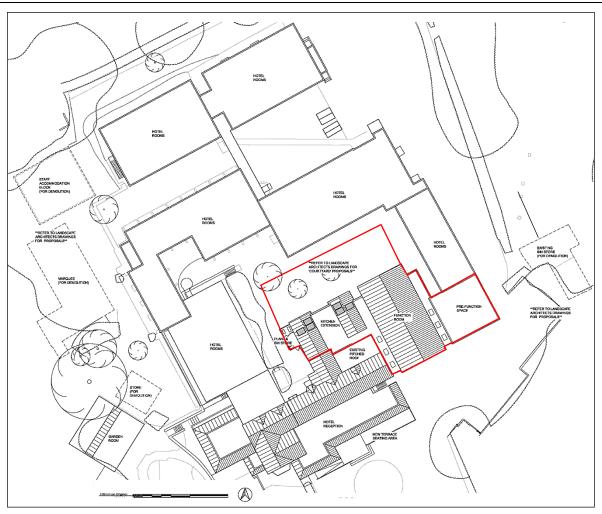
Development: extension to the existing hotel and landscaping highlighted (not to scale)
